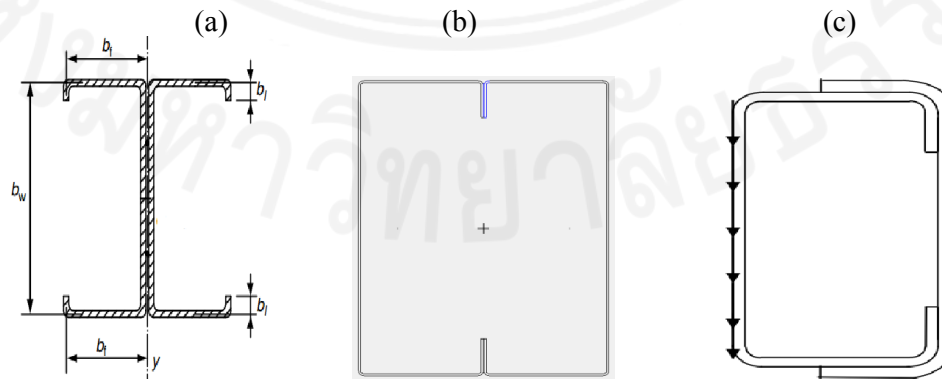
(a) Back-to-back; (b) face-to-face C-sections ; (c) nested C-sections
